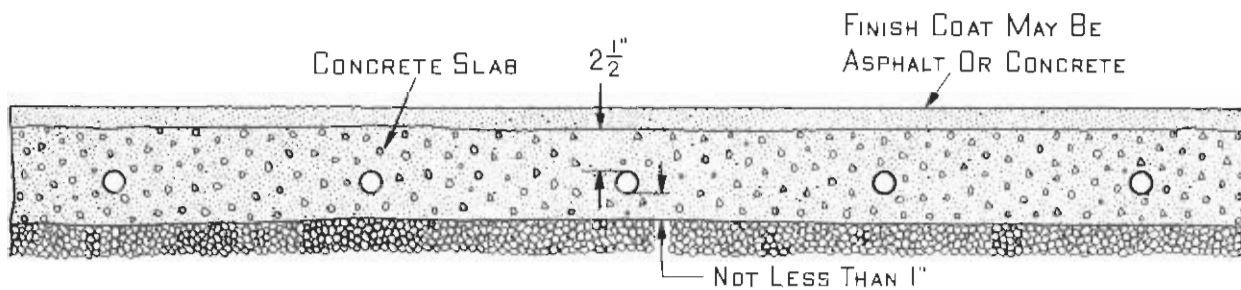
Total depth of concrete and bed of crushed rock or sand to be in accordance with installation requirements. Spacing $\frac{3}{4}$ -inch pipe on 12-inch centers, 1-inch pipe on 16-inch centers.
